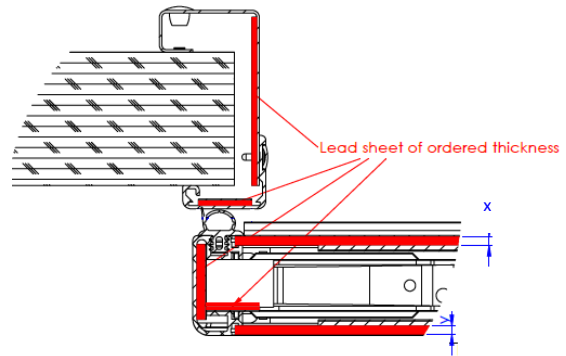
Top view cross section of a Medicare with Halmstad wall frame.
